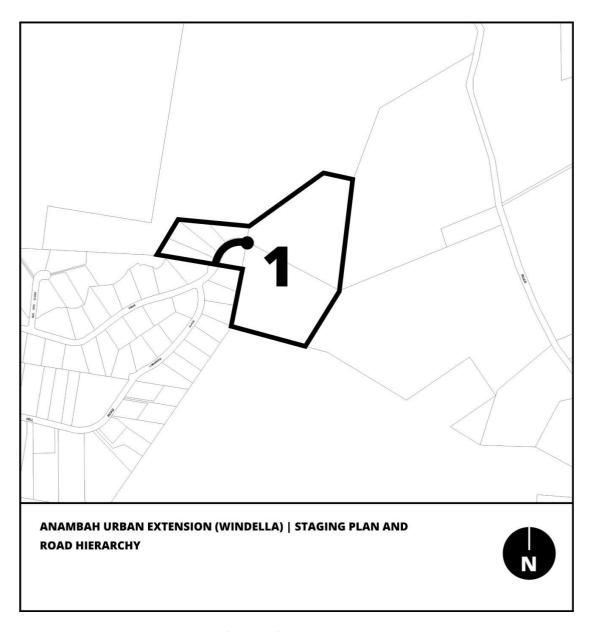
Anambah Urban Extension (Windella) Staging Plan and Road Hierarchy.
